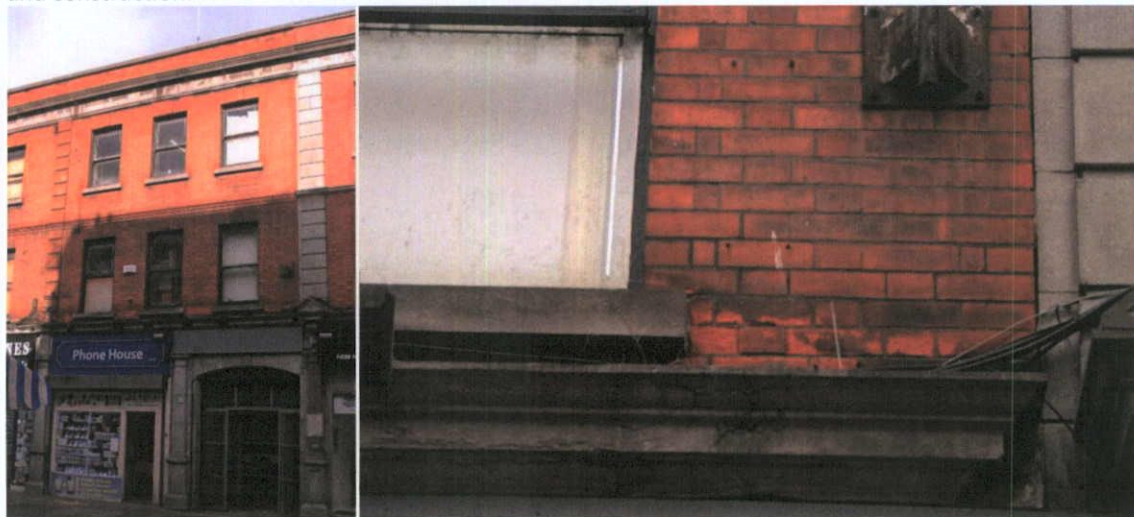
No.3 Moore Street built with machine-cut homogenous red brick with limestone used for window cills and architectural detail. The masonry is soiled, exaggerating certain stone features.
